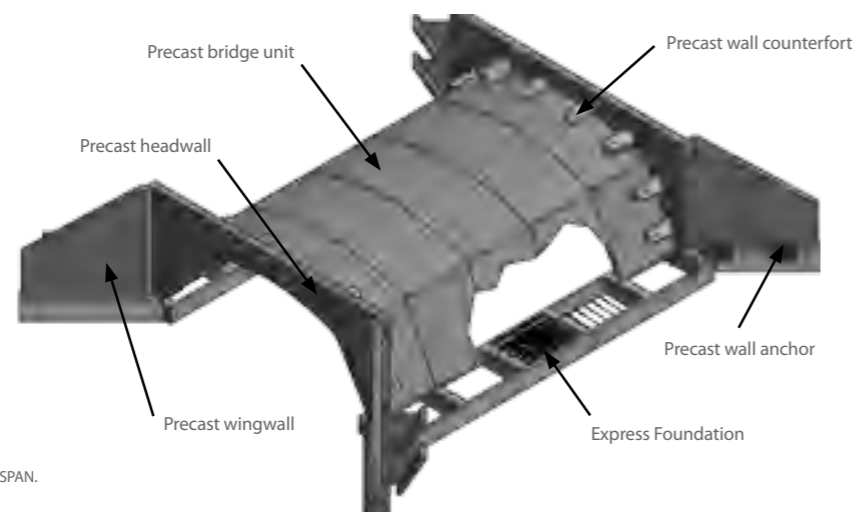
Elements consists of precast buried bridge system CON/SPAN.
